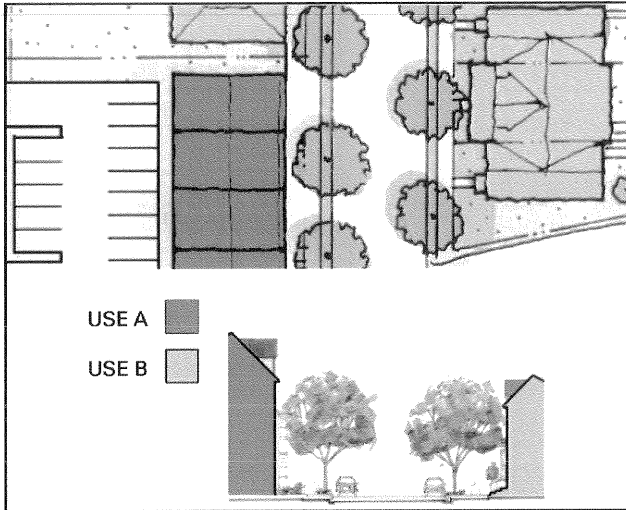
Ensuring similar façade height and width dimensions of opposing façades can be an effective means of establishing a transition between uses.
